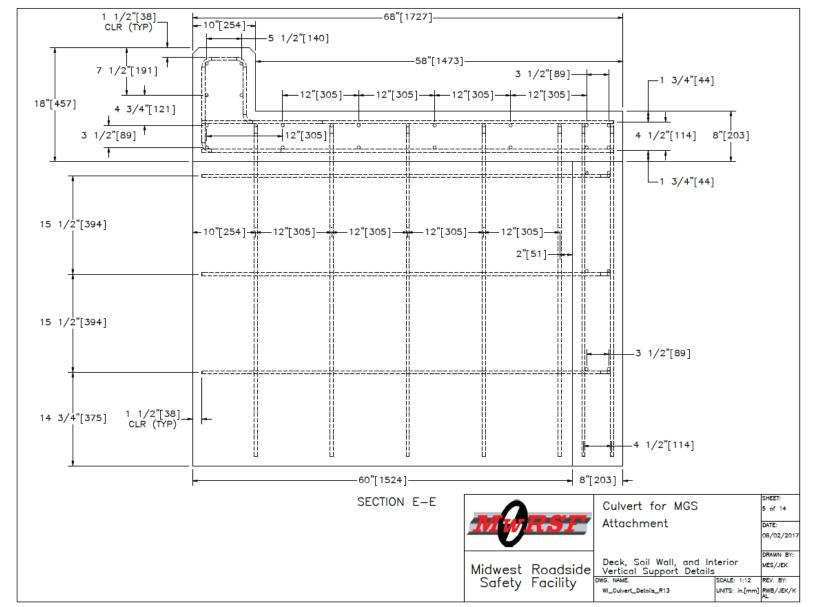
Top Slab, Soil Retaining Wall, Interior Vertical Support Wall Details, Test Nos. CMGS-1 and CMGS-2
